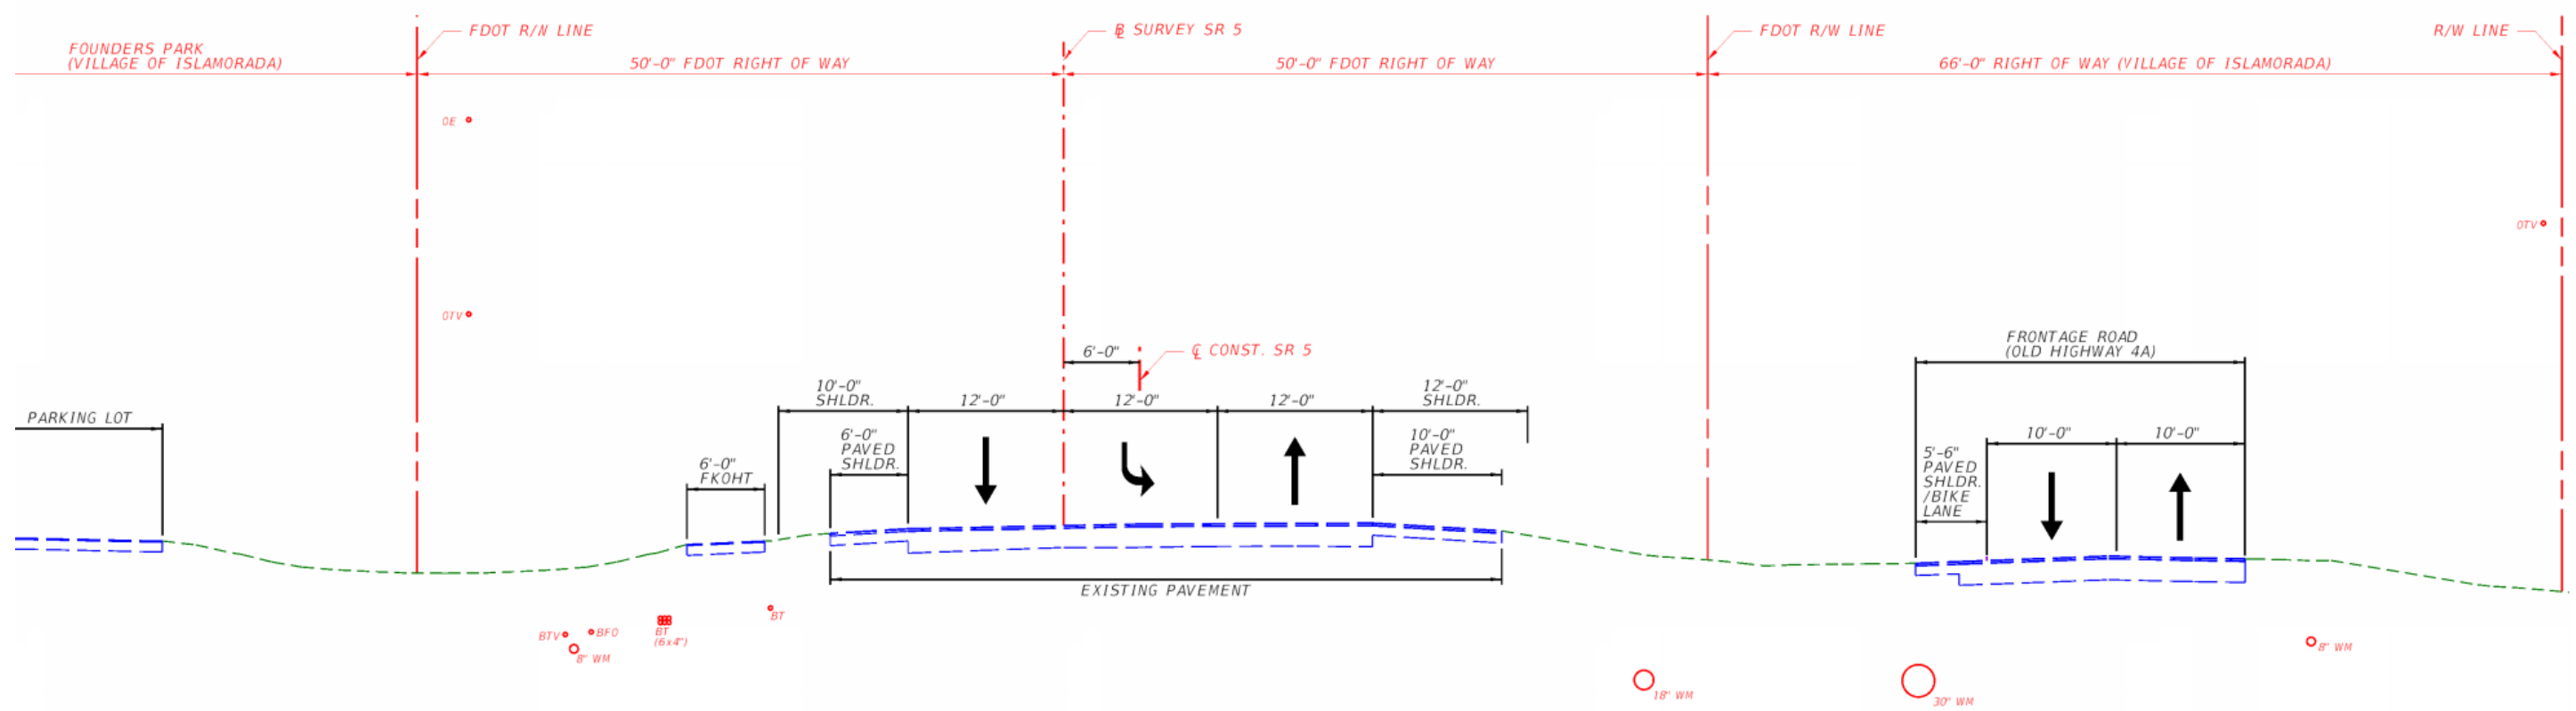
Location 1 (MM ±87) Existing Typical Section
